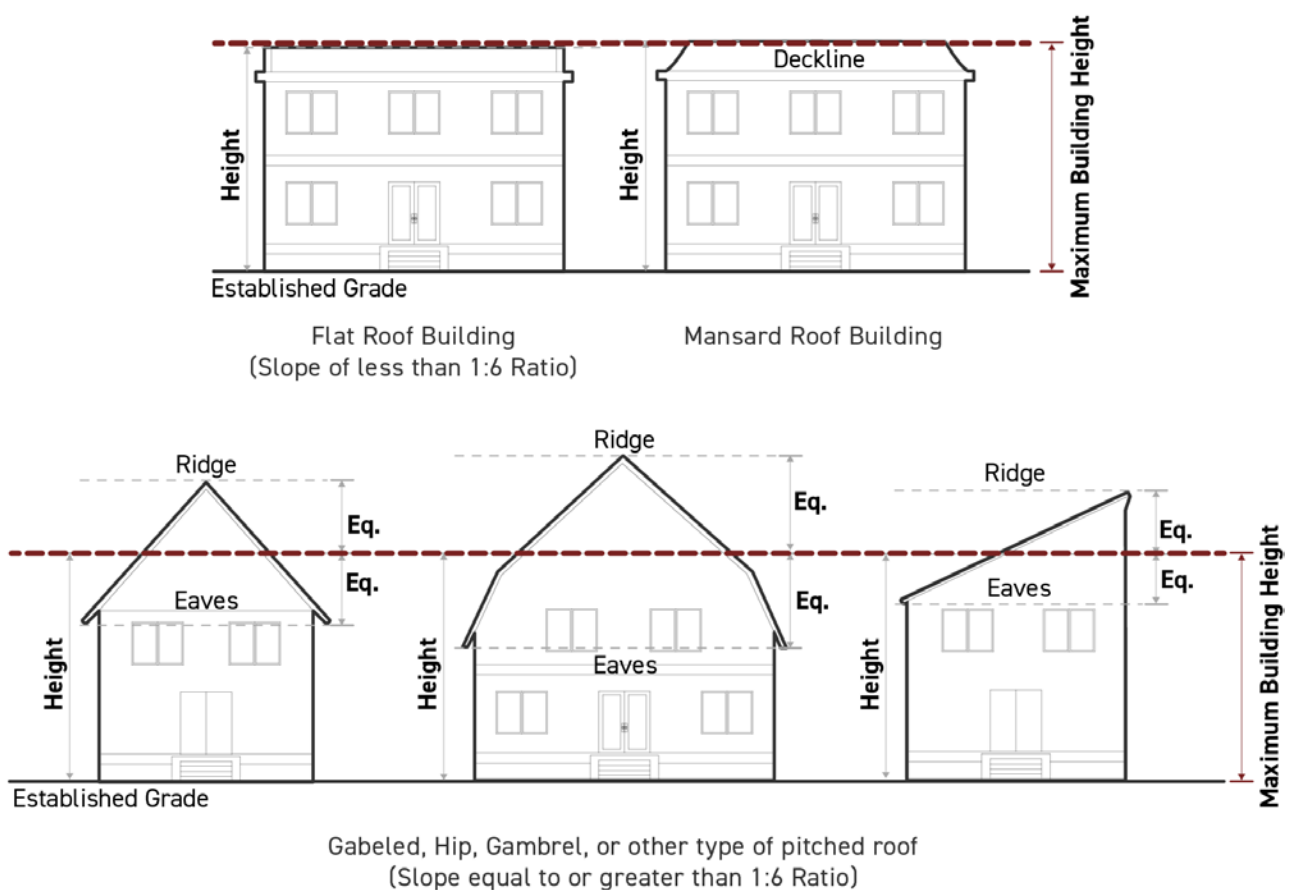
Section 11 – Building or Structure Height of less than 5 Storeys
